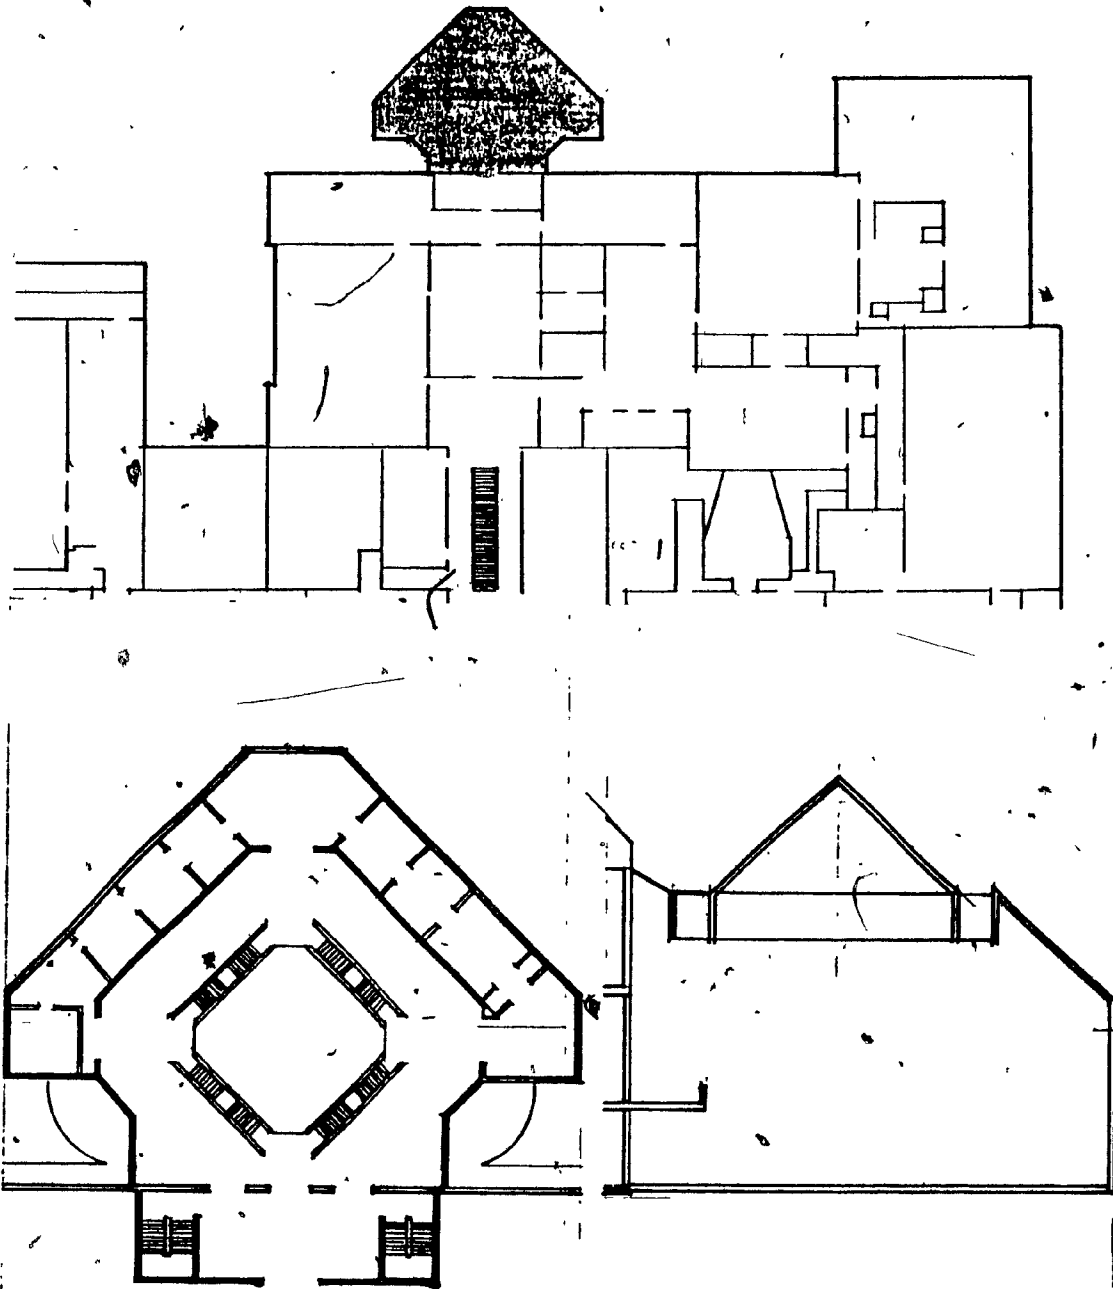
, (a) Ground floor plan of the museum, Lehman Gallery,
